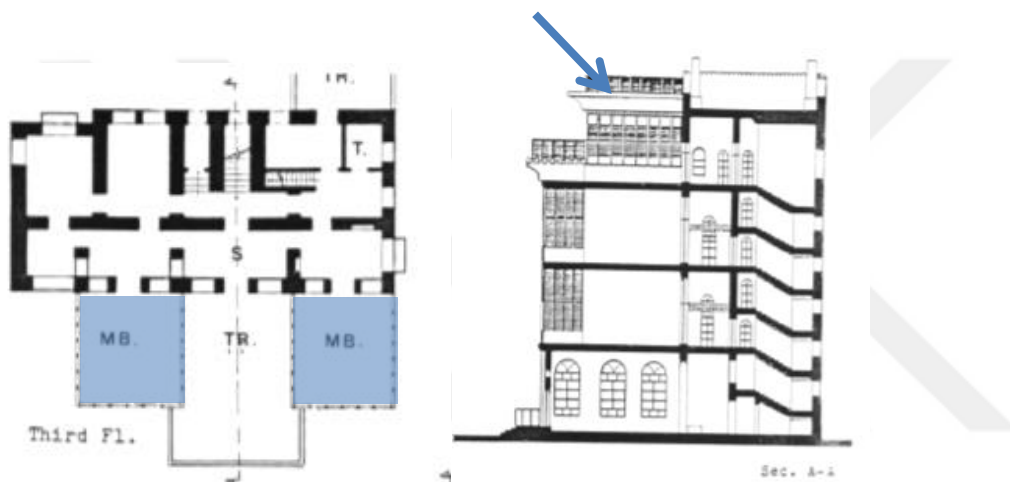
Al-mabit in Al-Jukhdar House third floor plan & section (Al-lyali,1990)
